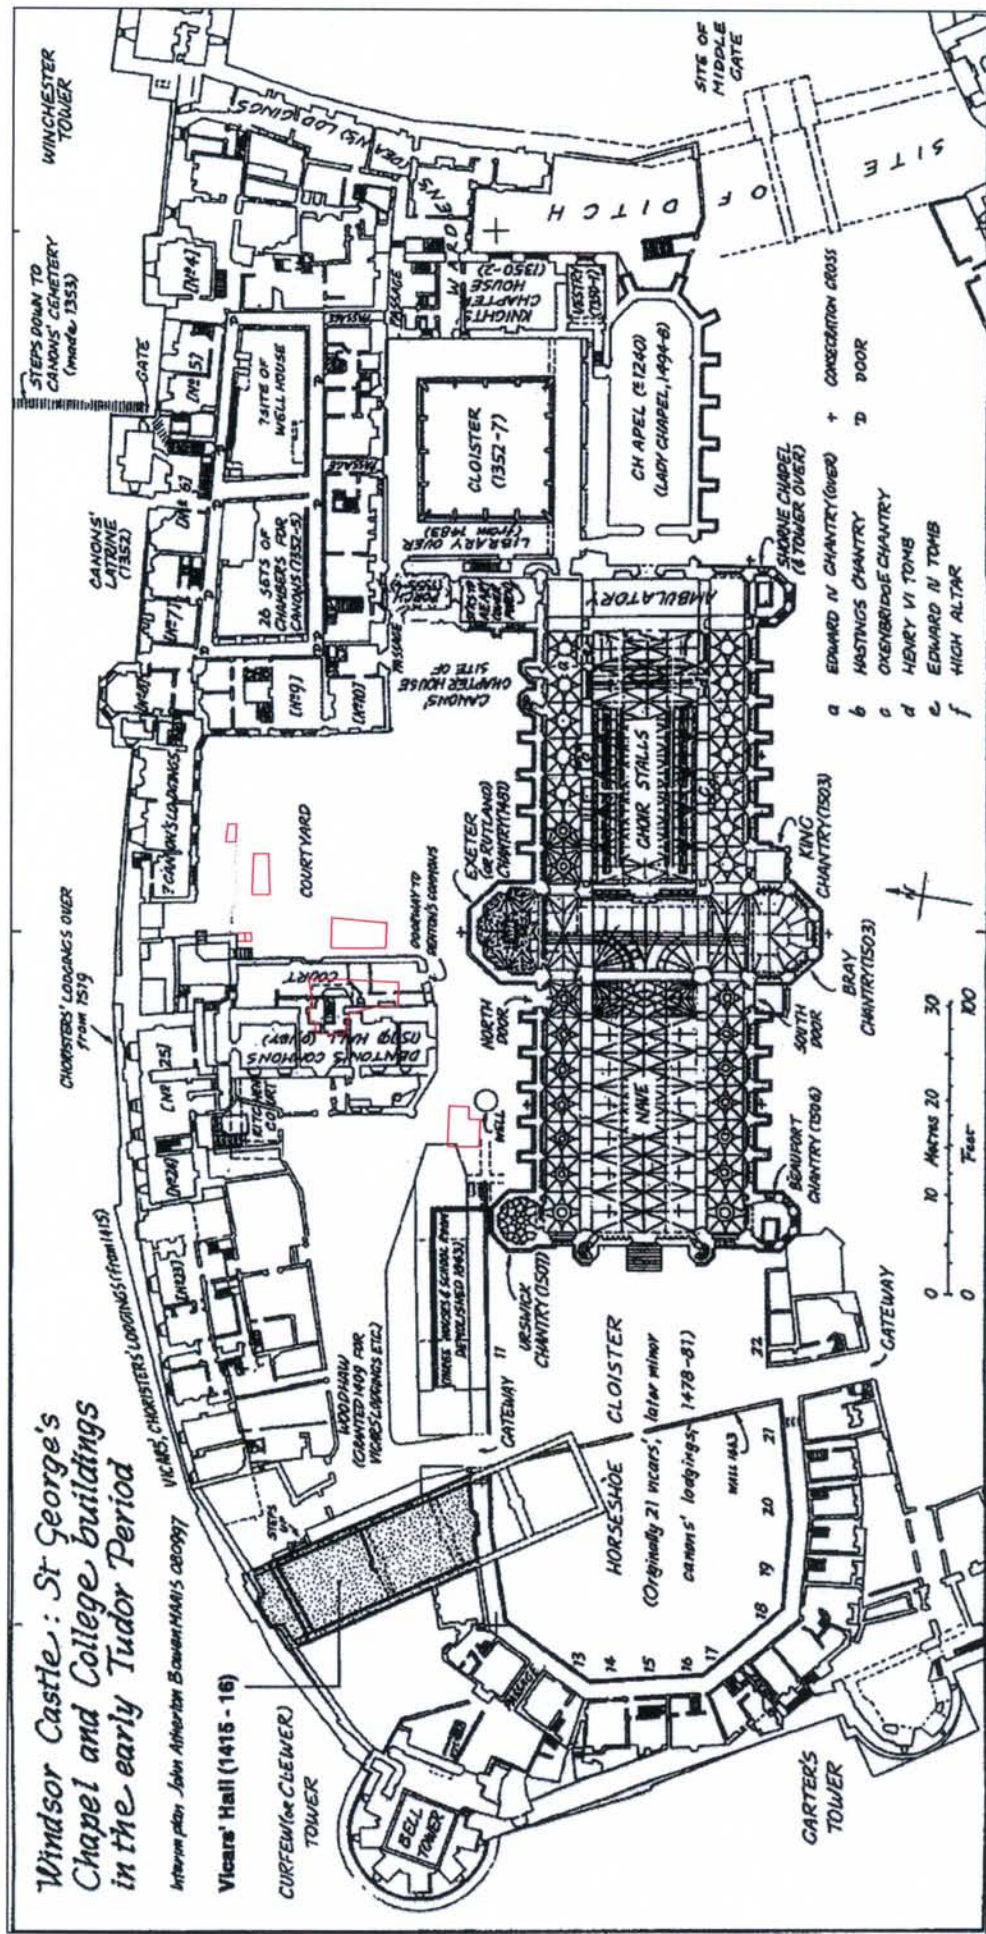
Windsor Castle: St. Georges Chapel and College buildings in the early Tudor period with location of trenches shown in red.
